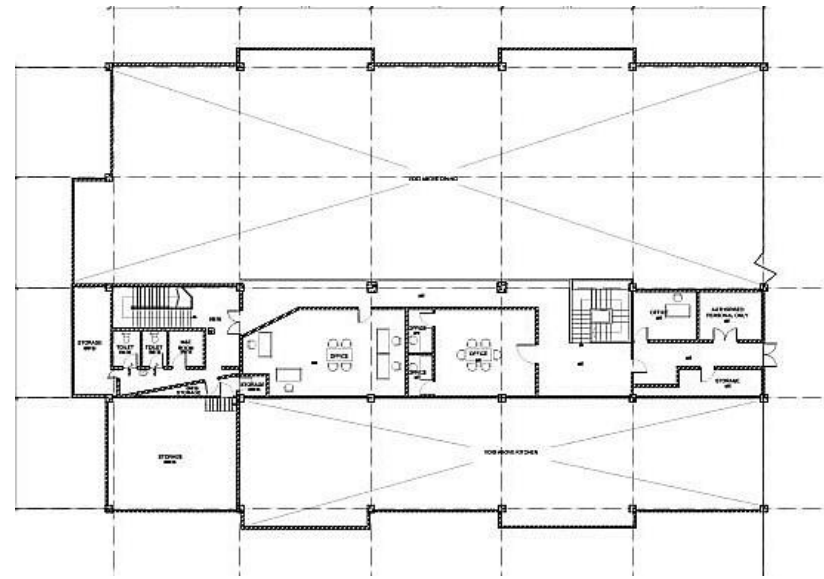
Second Floor plan with grid lines (Measure Drawing Group 3 team, 2017)
